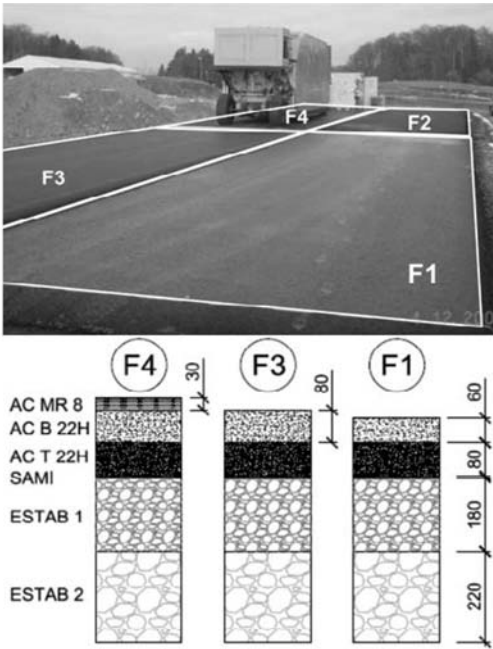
Layout of the sections and layers of the three pavements trafficked with the MLS10.
